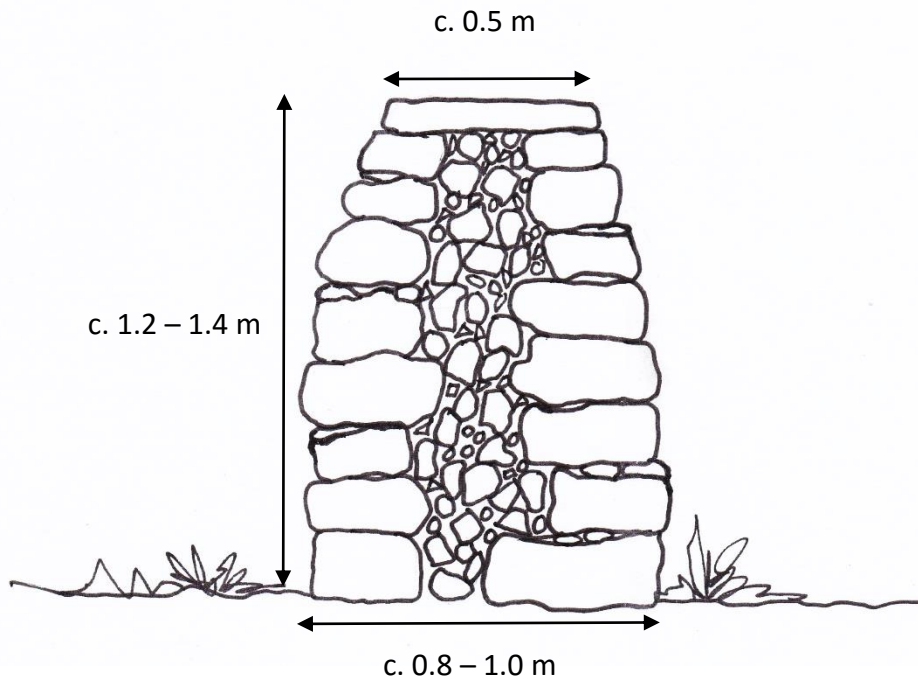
Schematic cross-section through the Standvastigheid stone walls showing an undamaged section.
